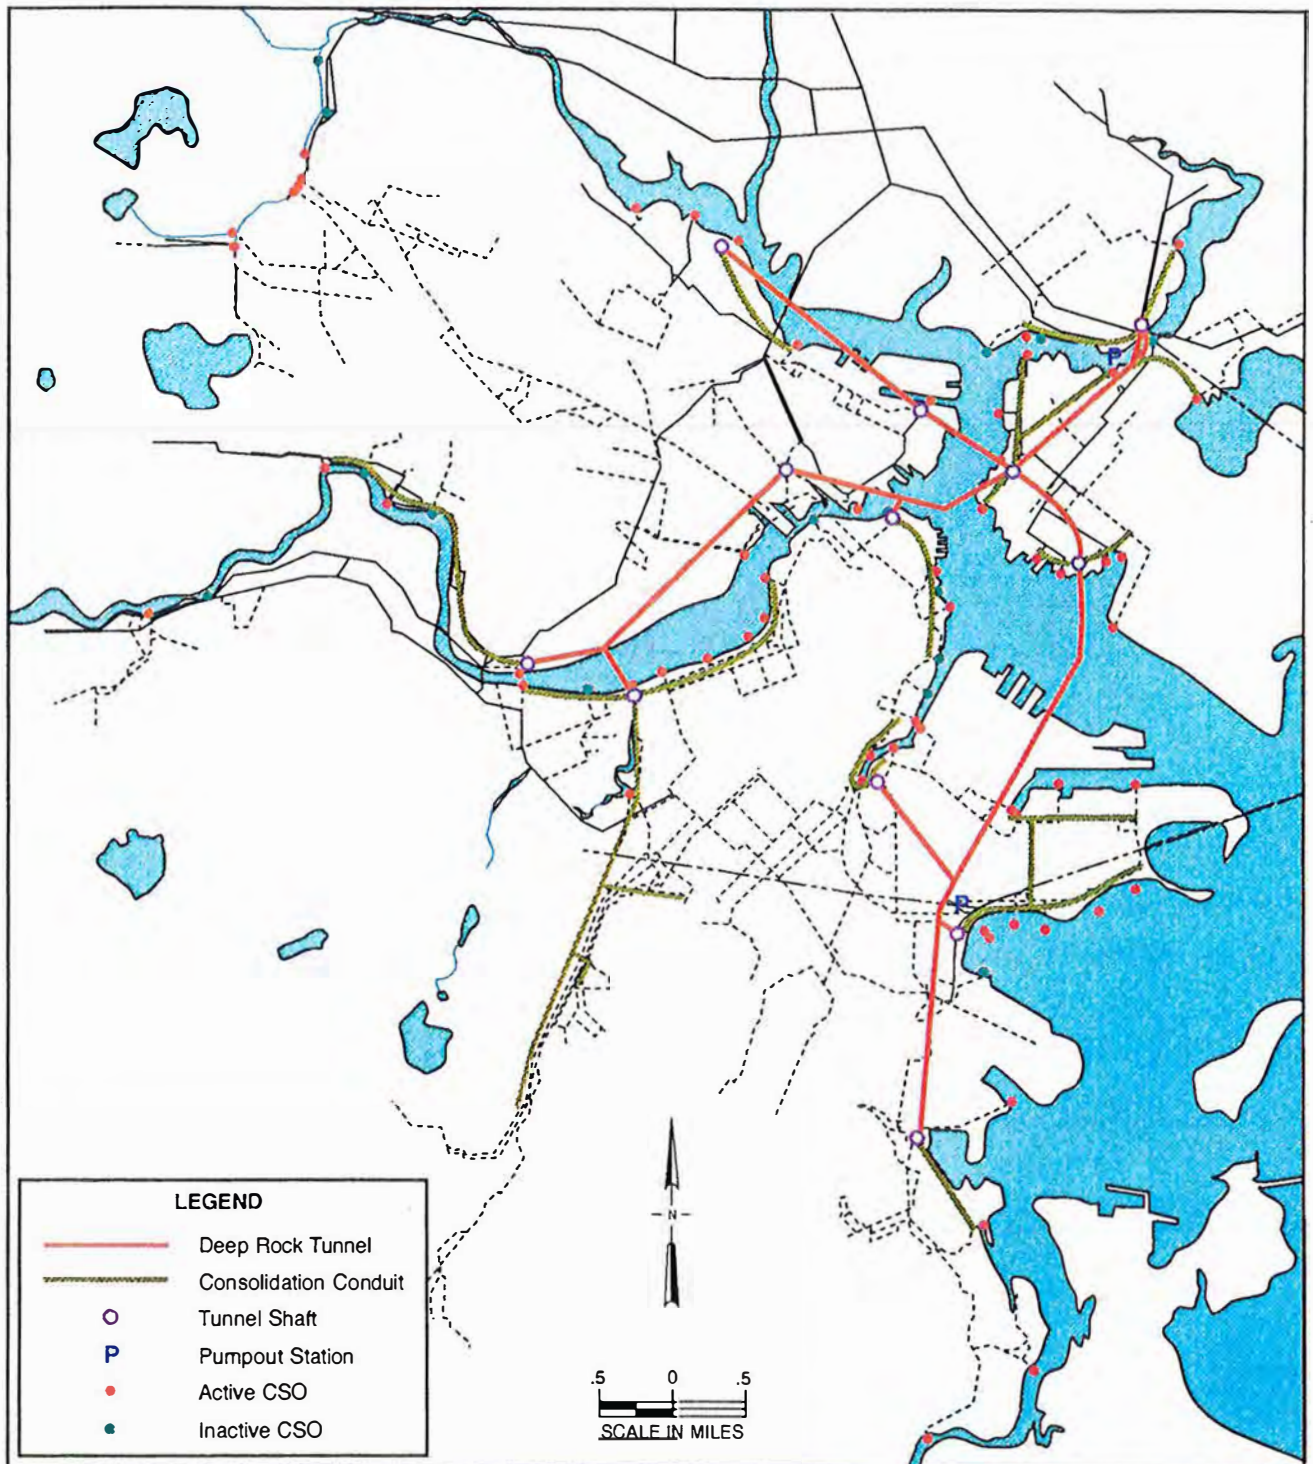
CSO TUNNEL PLAN FOR 1-YEAR STORM
